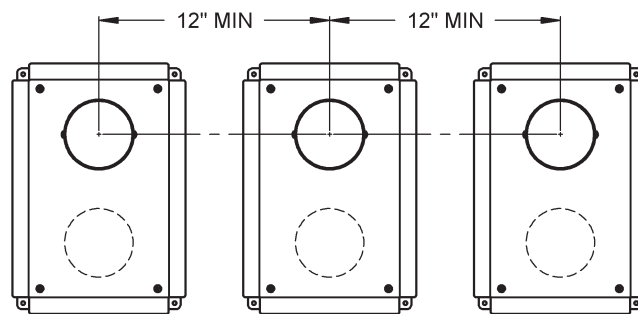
Minimum separation for multiple vent installation, vertical orientation
